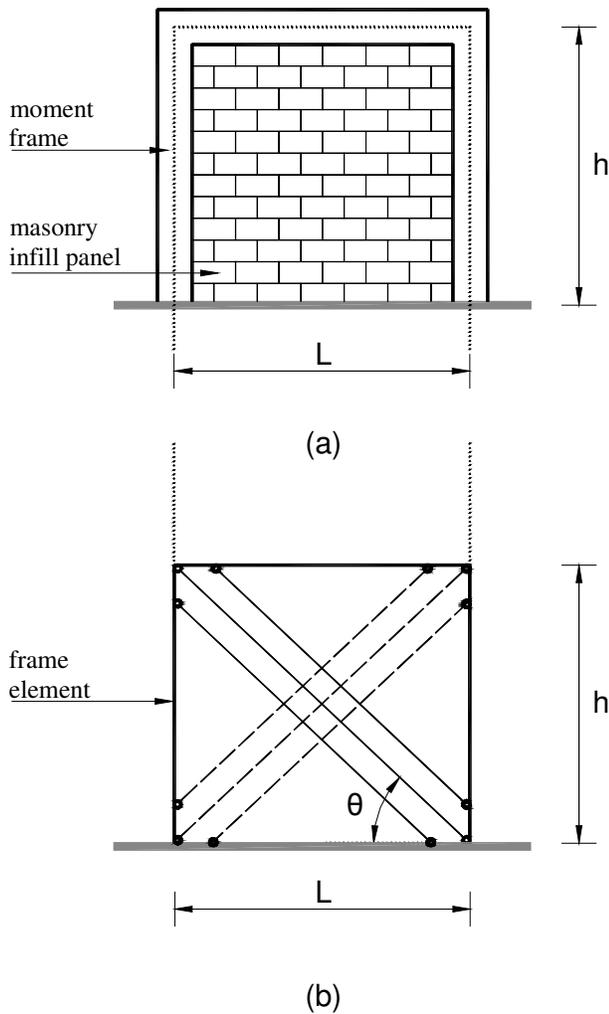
Six-strut model for masonry infill panel in frame structures: (a) Infilled frame structure; (b) Infilled frame model.
